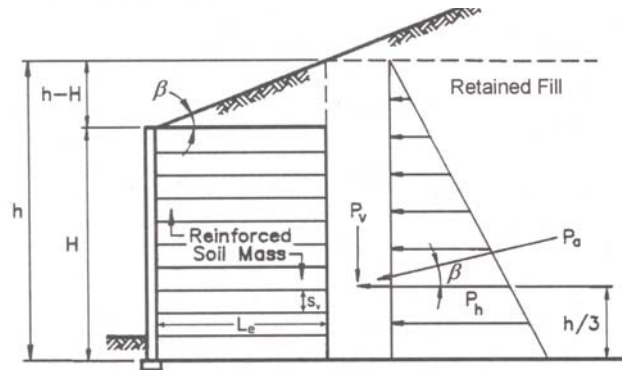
AASHTO Figure 3.11.5.8.1-2 – Earth Pressure for MSE Wall with Sloping Backfill Surface
